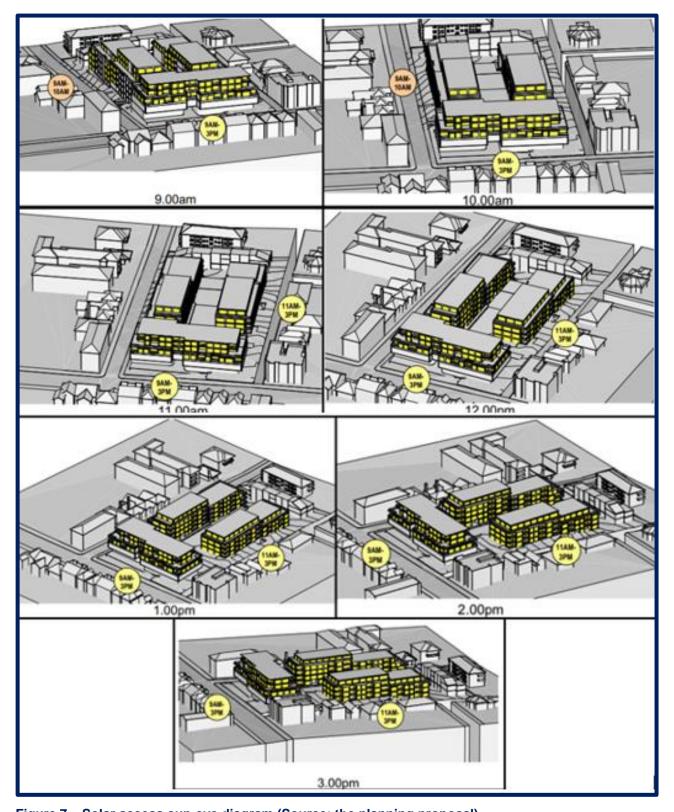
Solar access sun-eye diagram (Source: the planning proposal)
